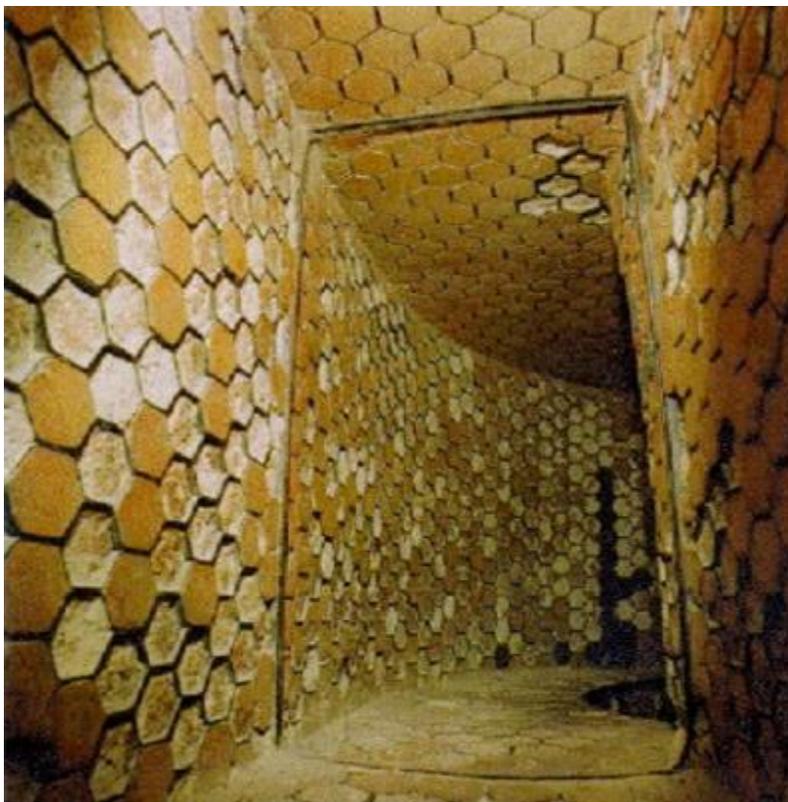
Spalling of Biscuits in Hexmesh
